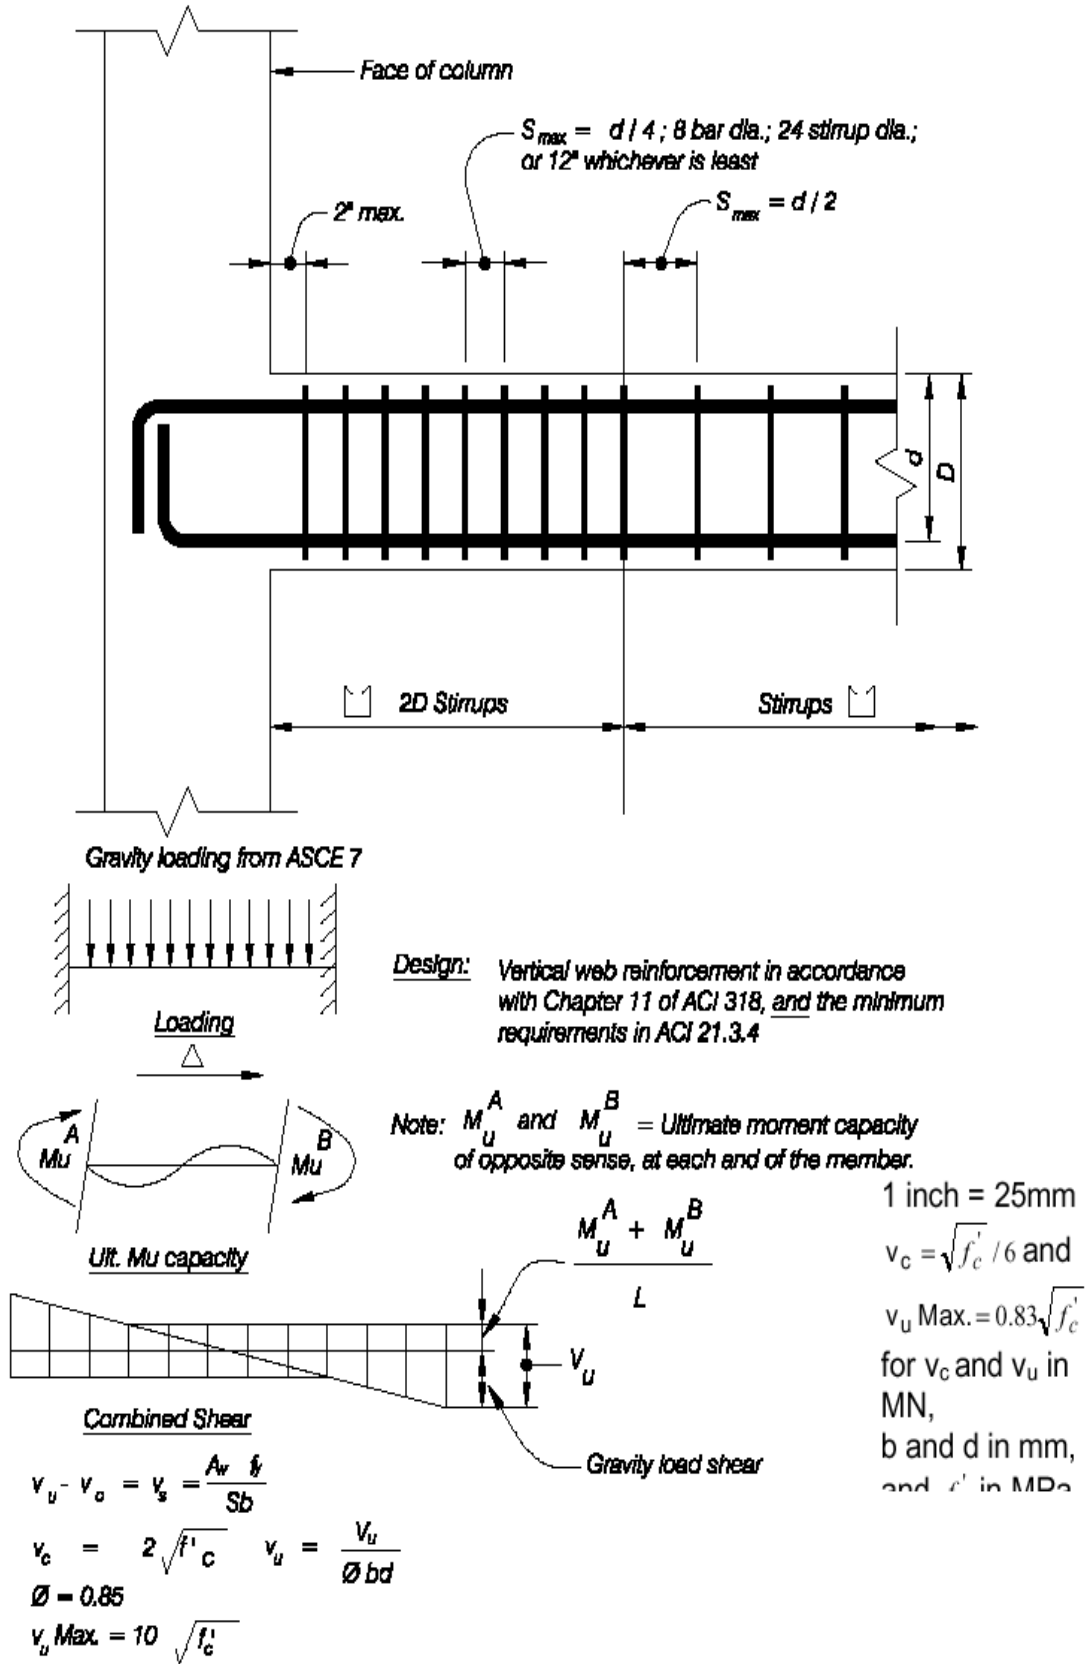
Intermediate Moment Frame Girder Web reinforcement
